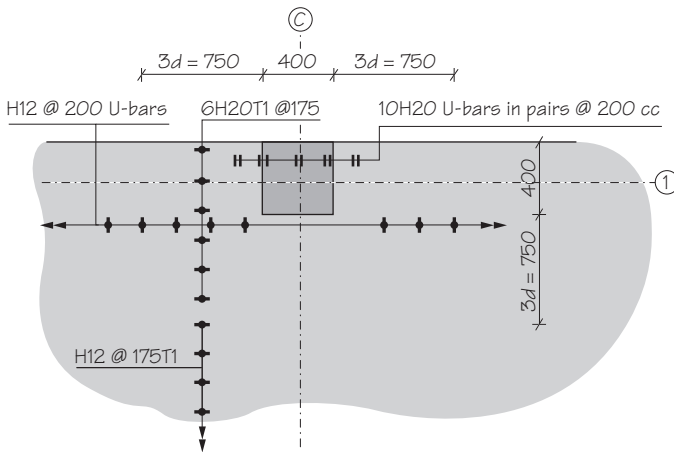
Flexural tensile reinforcement adjacent to columns C1 (and C3)
